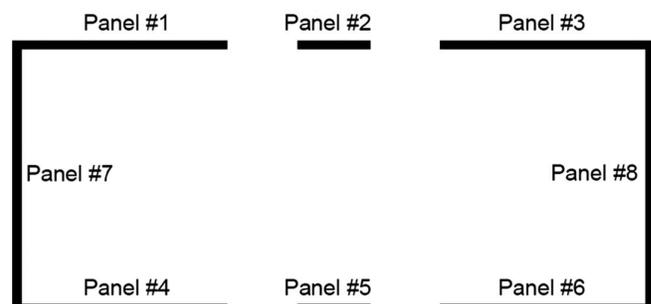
Plan view of sample building showing arrangement of concrete shear walls.
